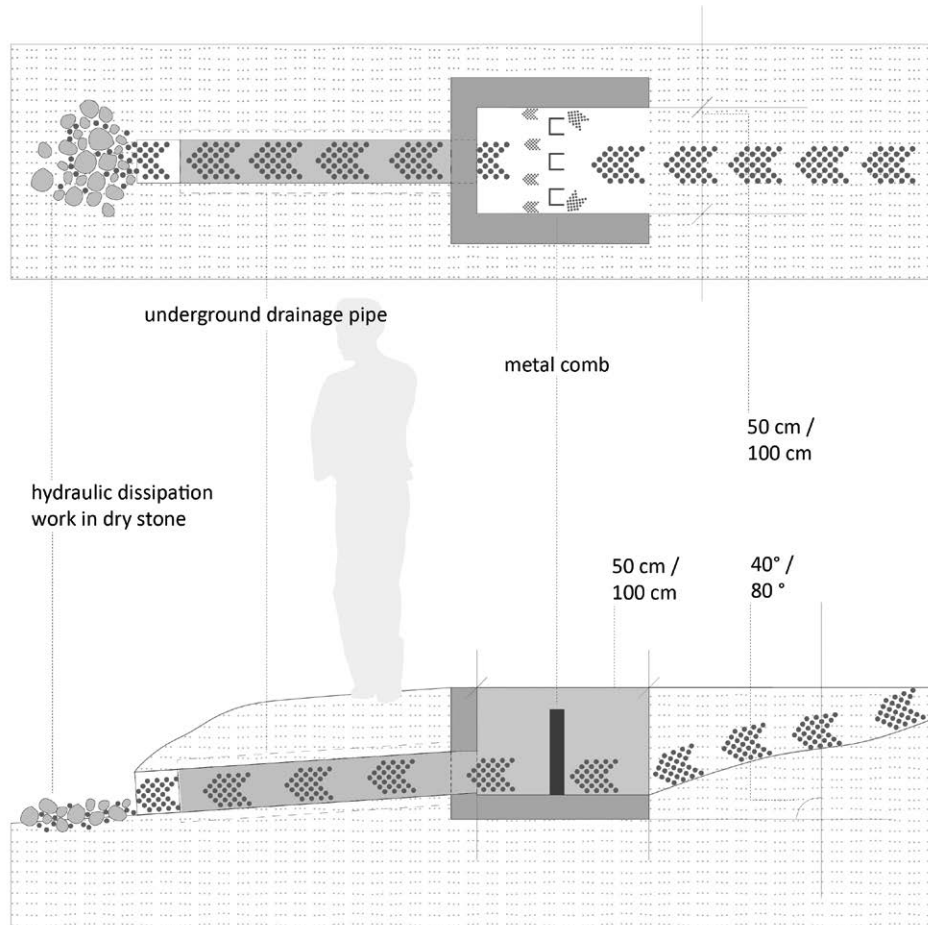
Model layout of a gutter constructed for underground drainage.
